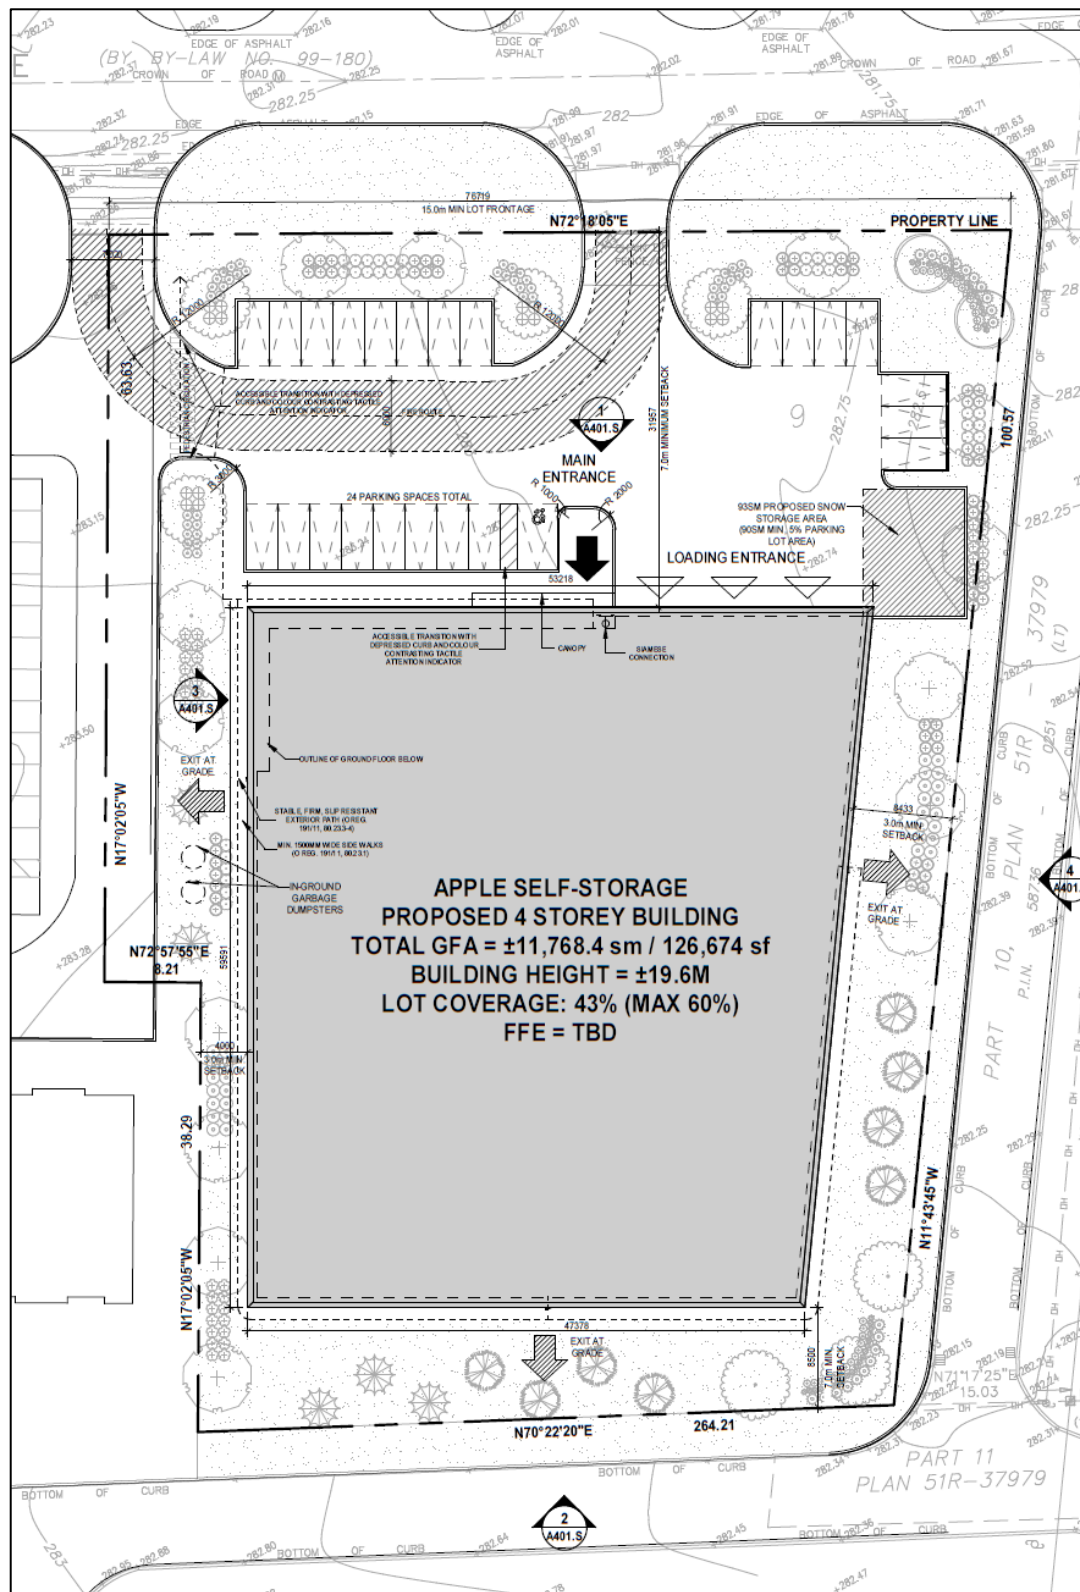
PROPOSED SITE PLAN EXTRACT, QUADRANGLE
